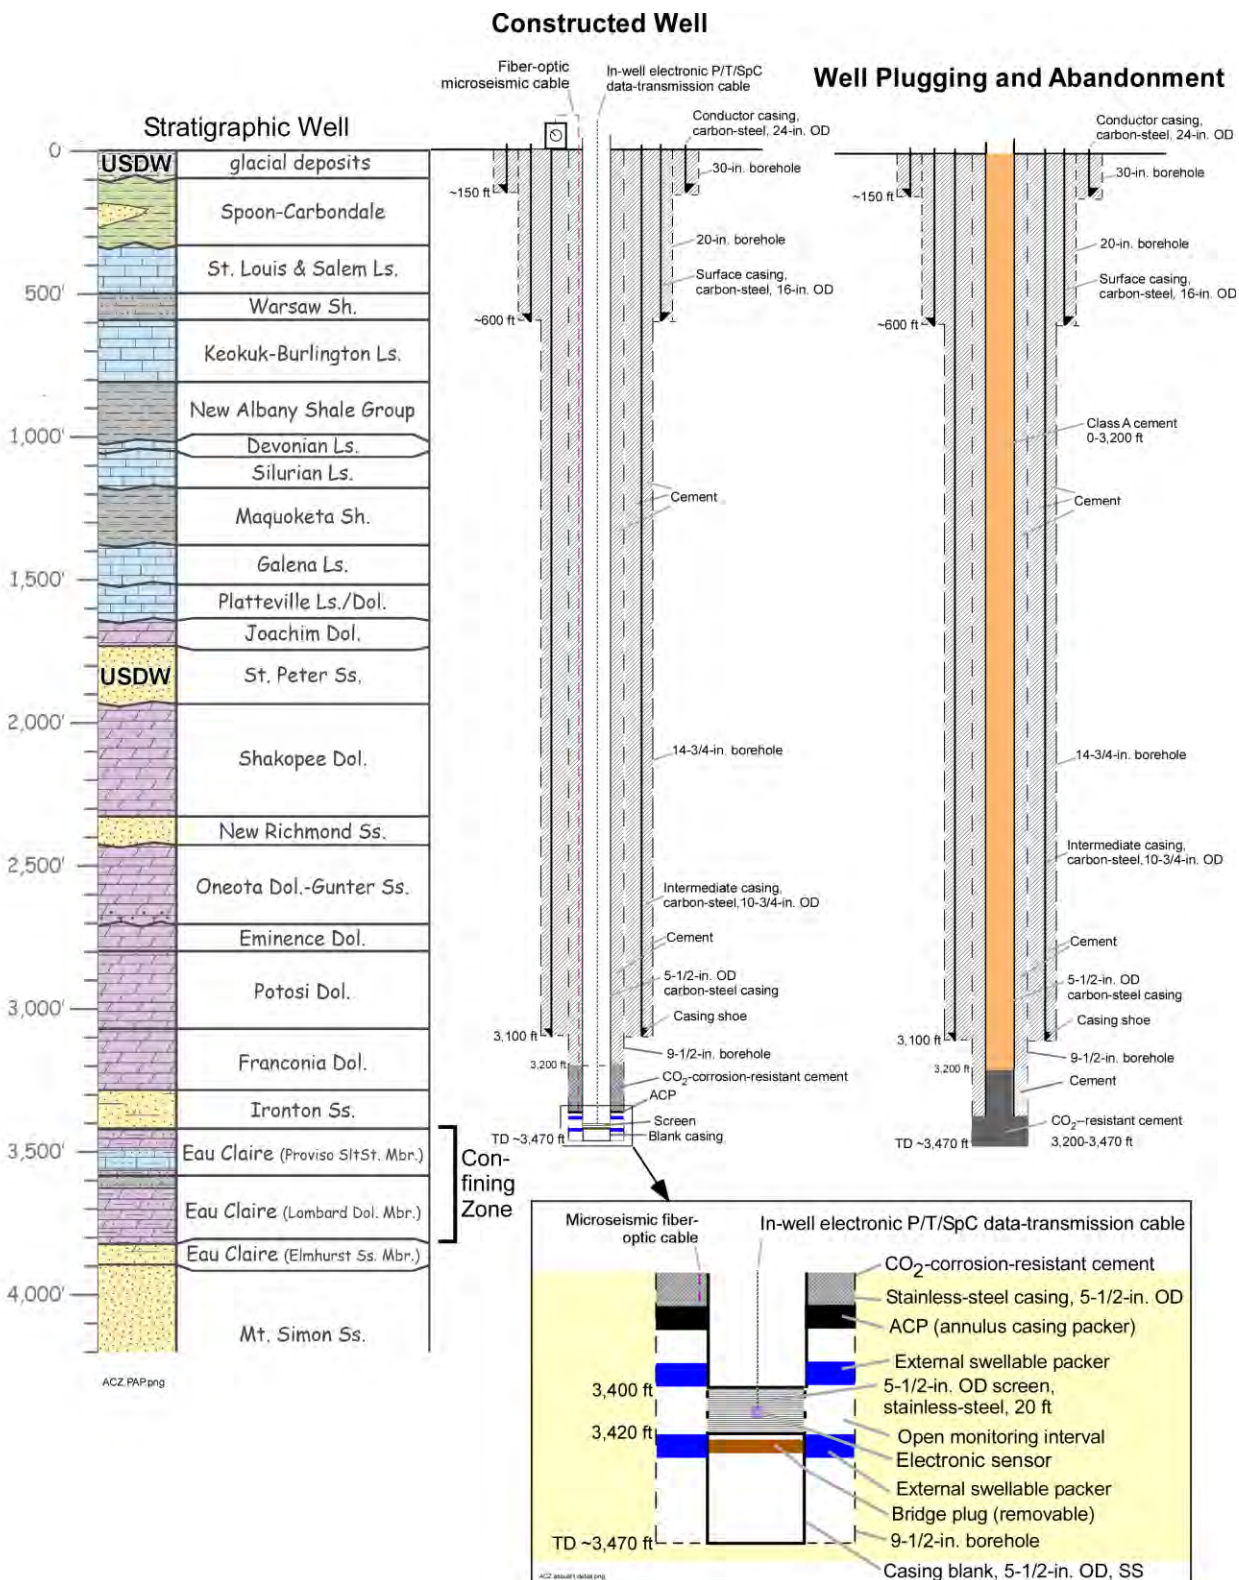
Construction design and plugging and abandonment plan for the Above Confining Zone monitoring wells.
